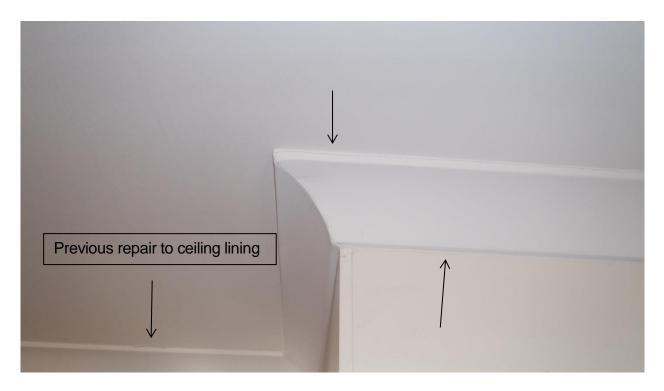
shows a crack to the wall lining from the cornice in the north western corner of the Lounge room (common with the Bathroom).
